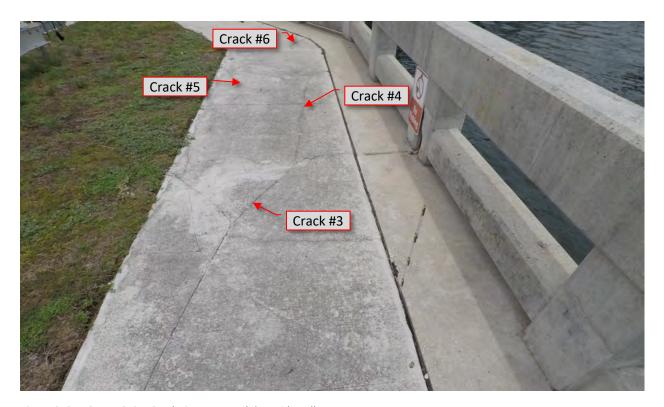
STA 6+15 - 6+25. Cracks in concrete slab to sidewalk.
